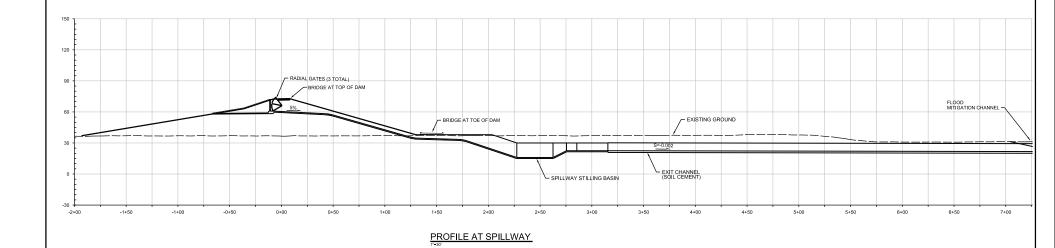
OUTLET AND SPILLWAY - PROFILES
